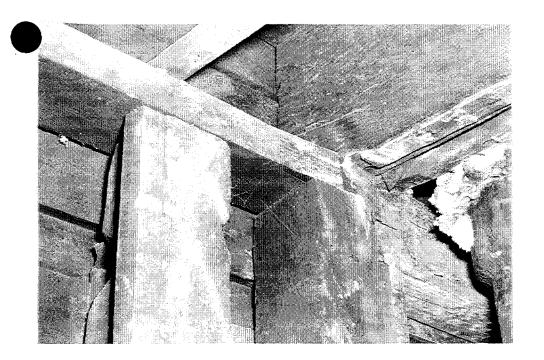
SOUTH PORCH BEAM OF SOUTHWEST PORCH
